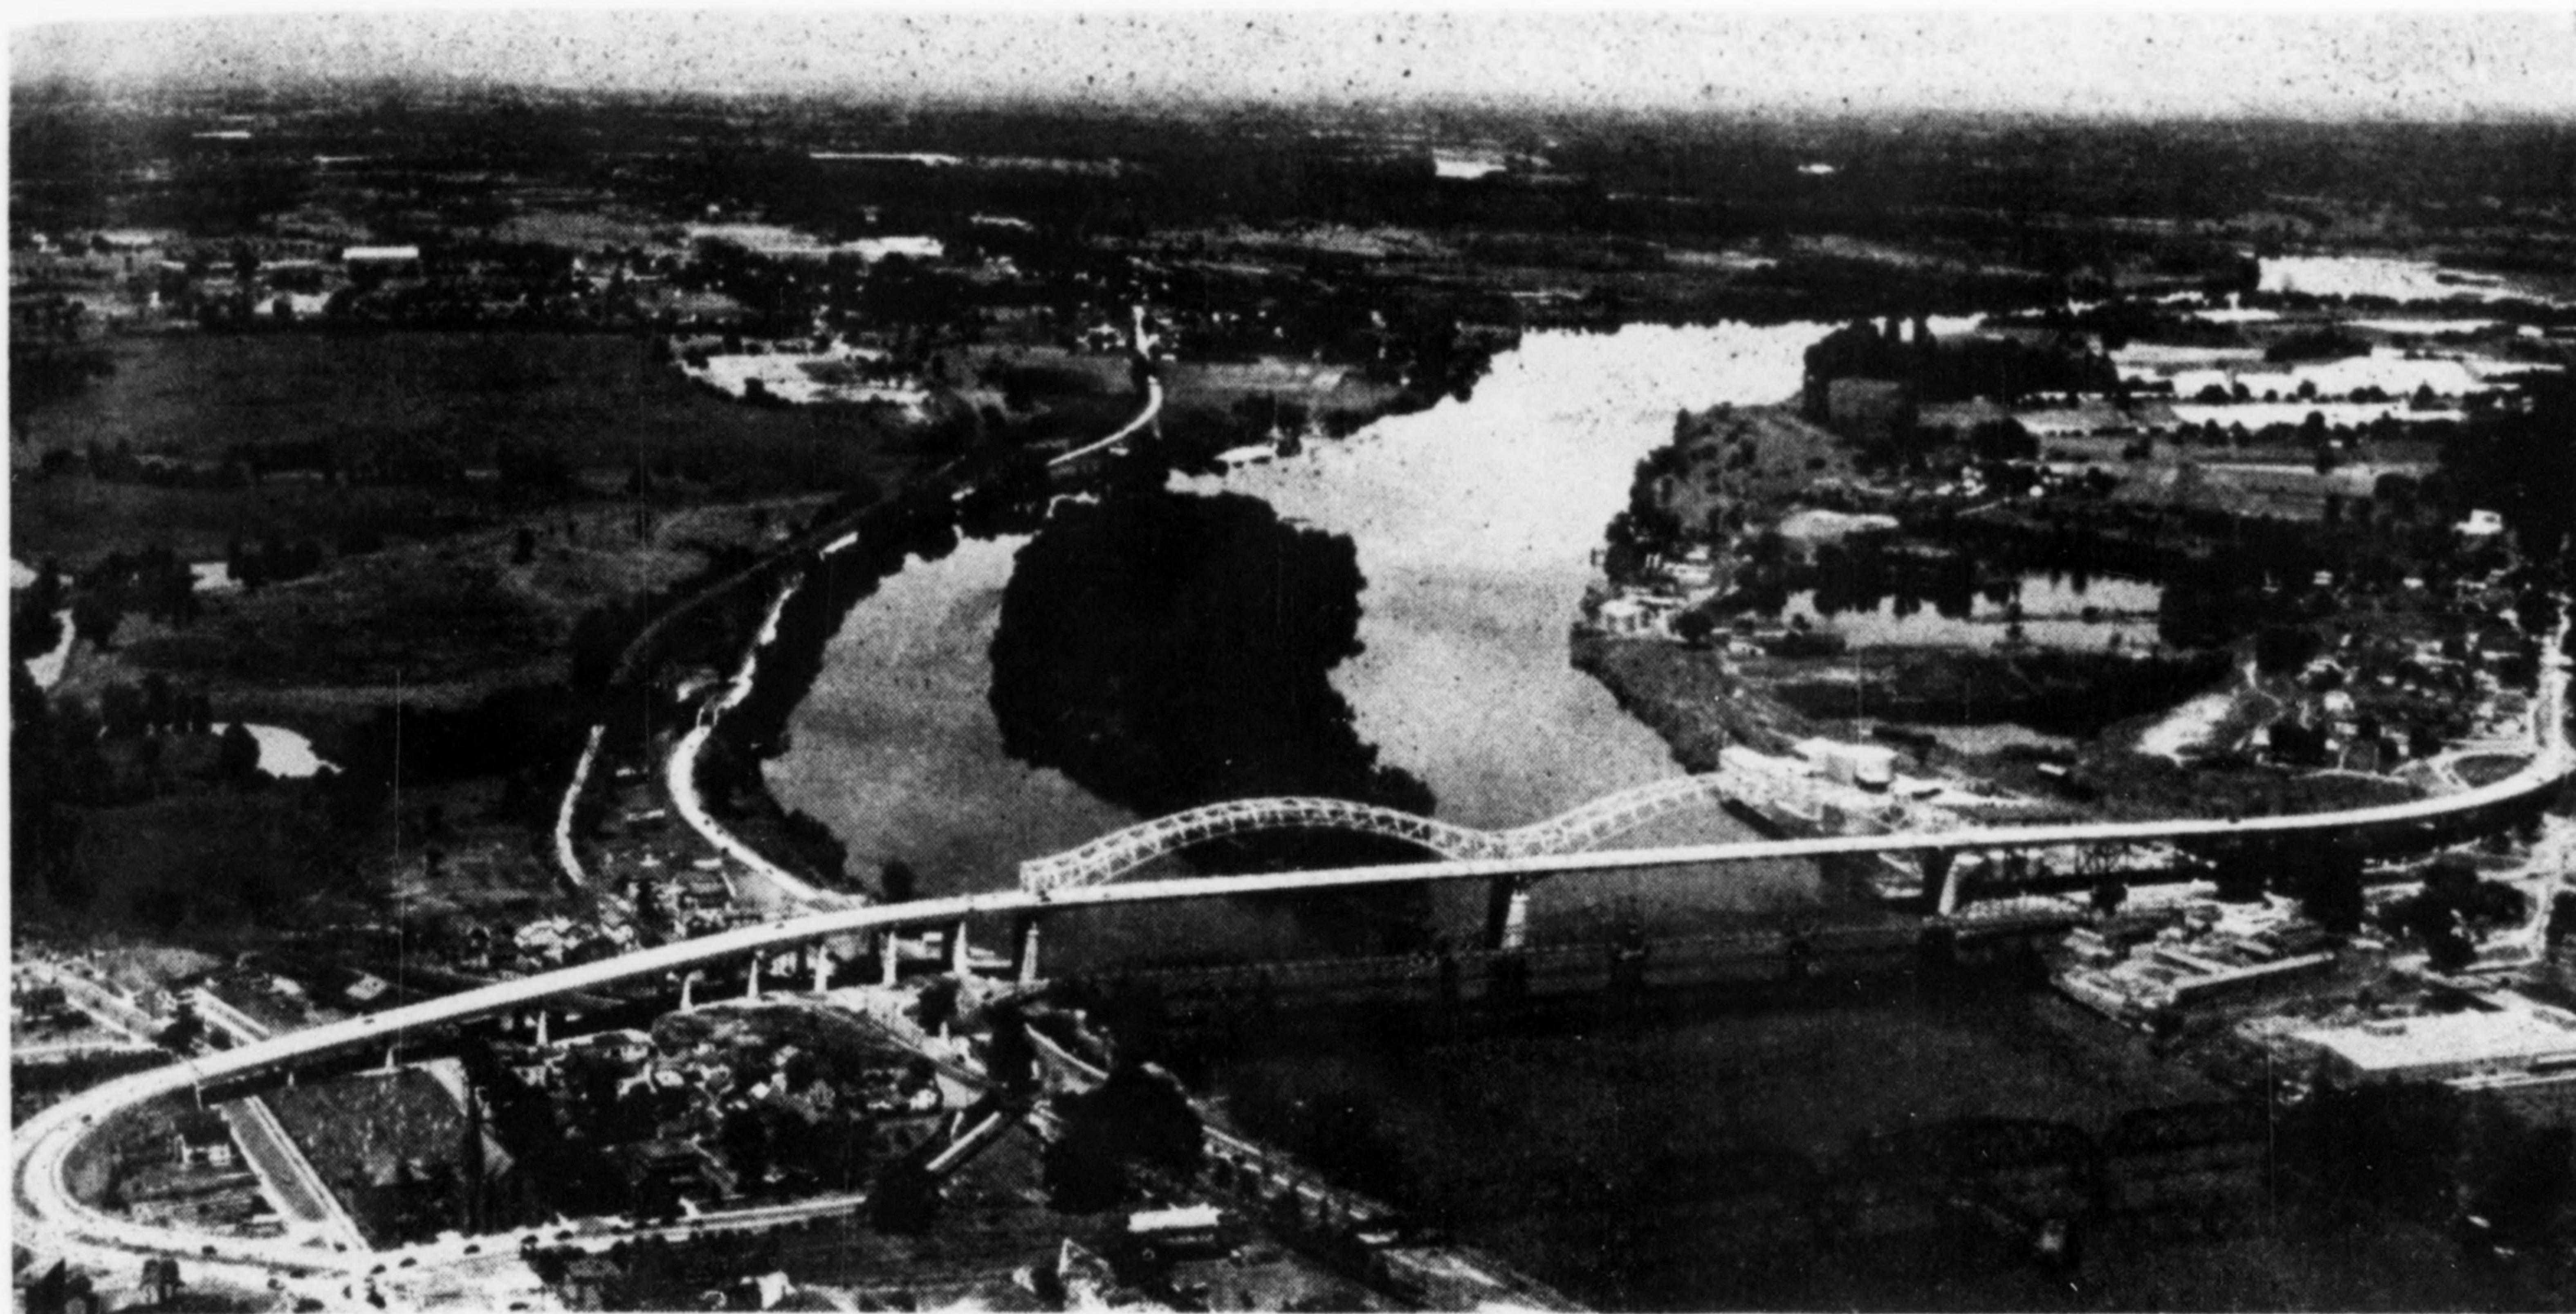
High above the adjacent old bridge, the twin arches of the new Middletown Bridge are out of reach of Connecticut River floods. The curved approach at the left comes to a grade on high ground on the main street of Middletown. Largest bridge in Connecticut, the cost was about \$3,500,000.
